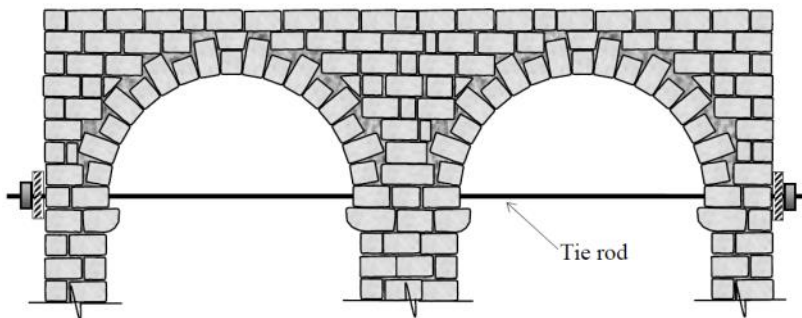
Tying scheme for a two span vaulted ceiling [50]
